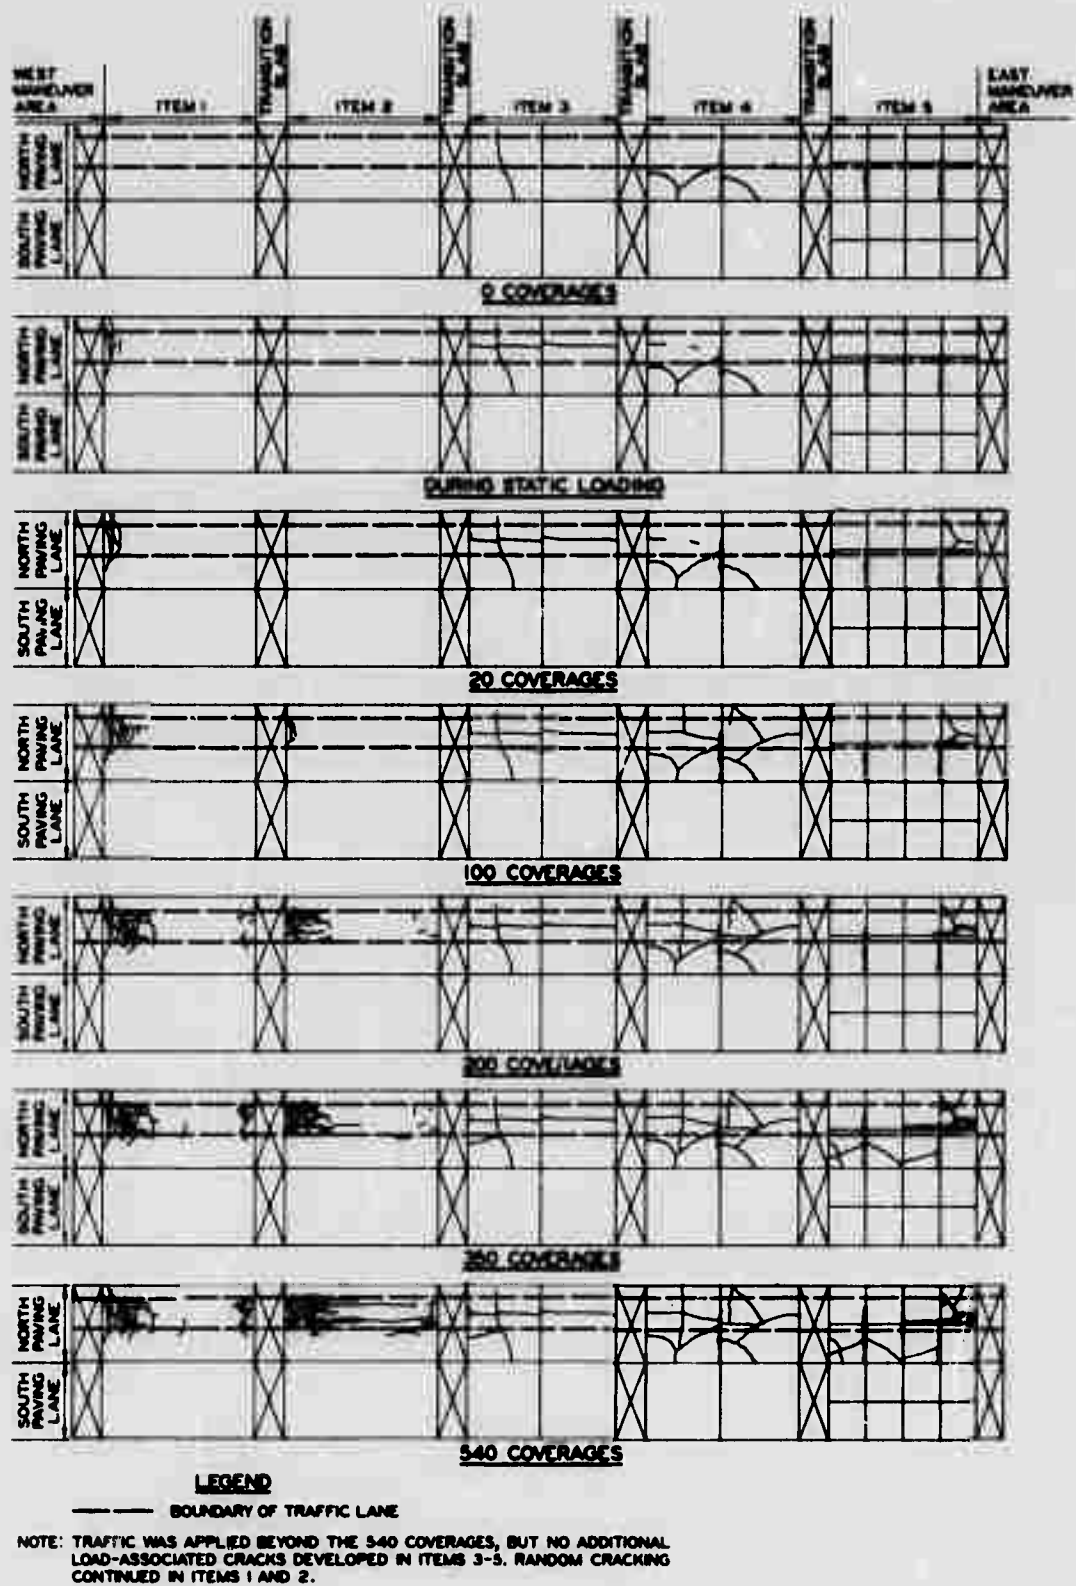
Crack development in lane 2, rigid pavement test section
